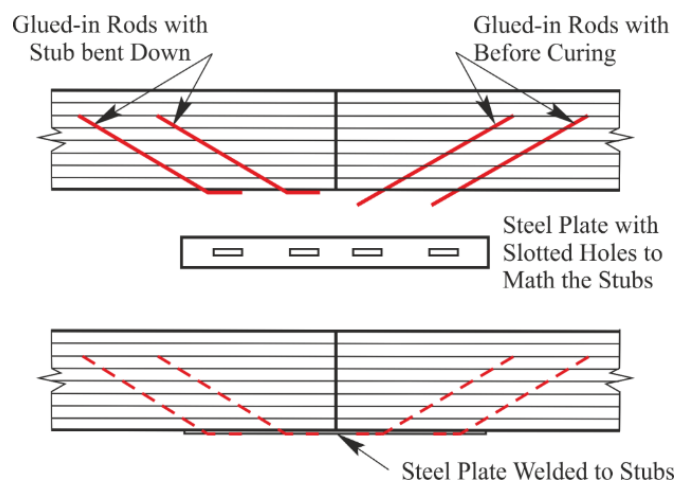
The connection of two half-beams on glued and welded steel rods
